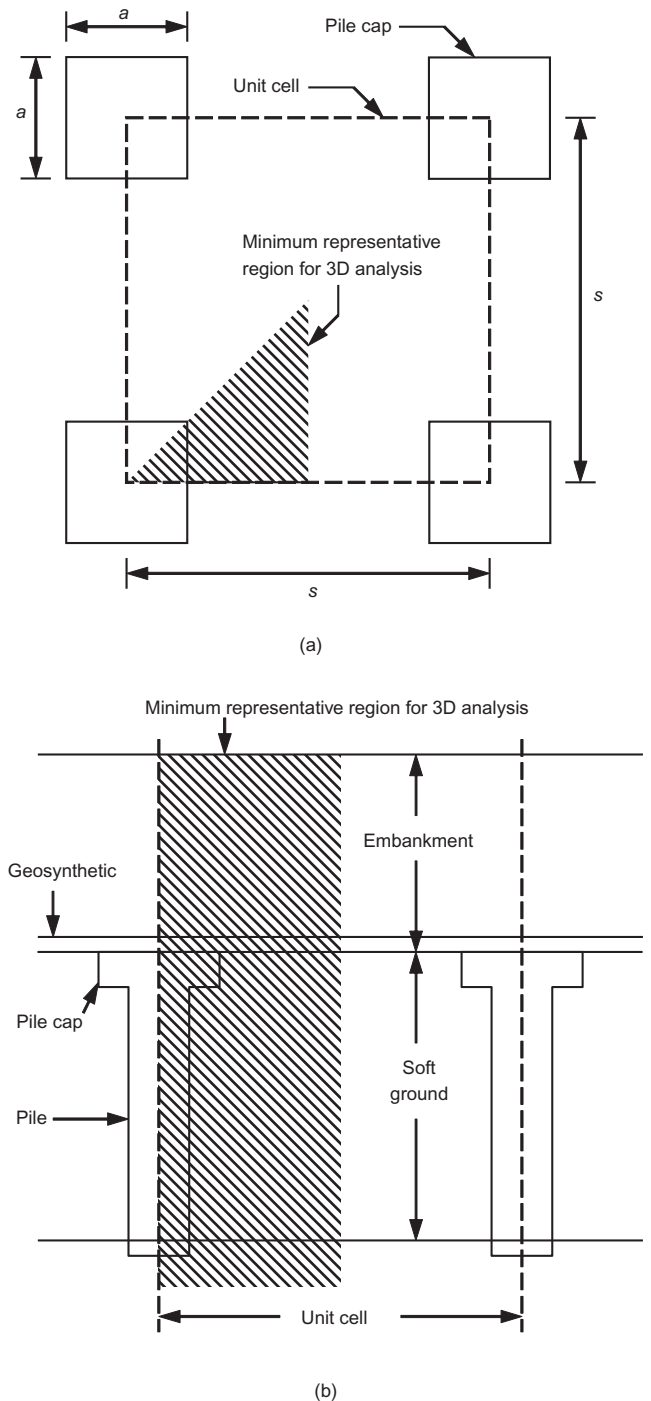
Unit cell in a column-supported embankment: (a) plan; (b) elevation
